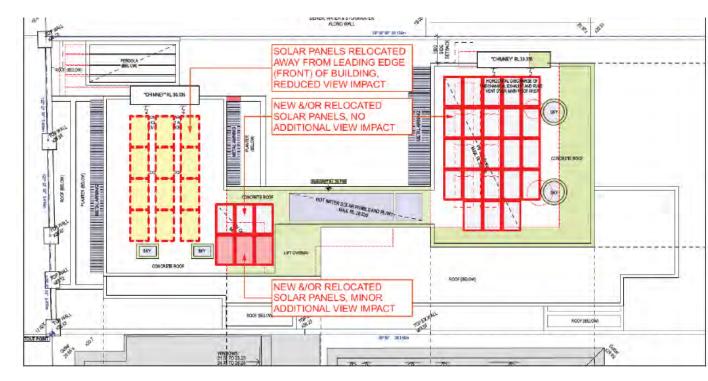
Plan indicating the portion of the proposed modification that will contribute to additional view loss as well as view loss reduction (*Source: MHNDUNION, 2021*)
